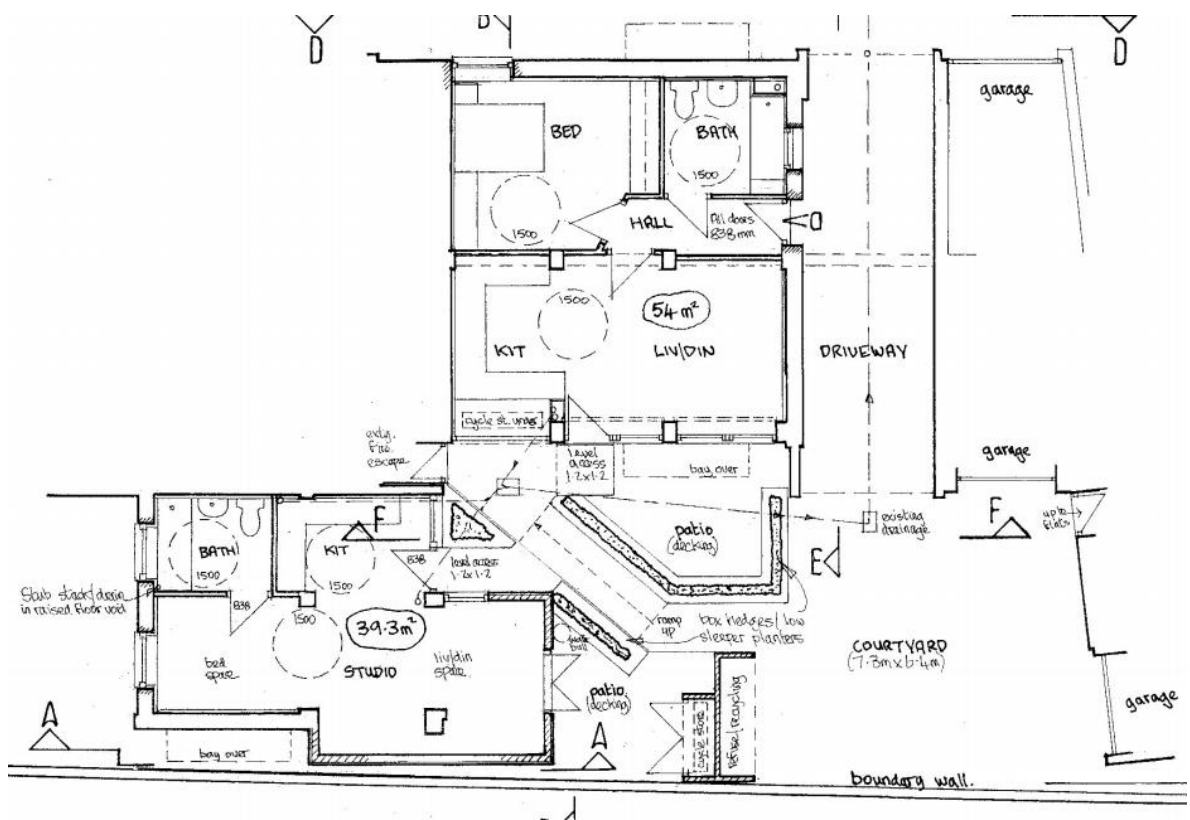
Approved Site Layout Plan (Reference BH2015/04654)
